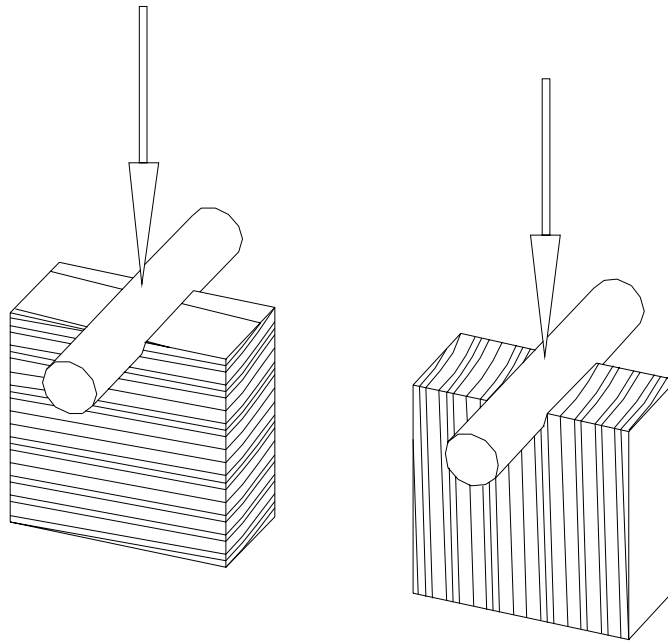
Dowel Bearing Fixture with Loading Perpendicular and Parallel to Grain
